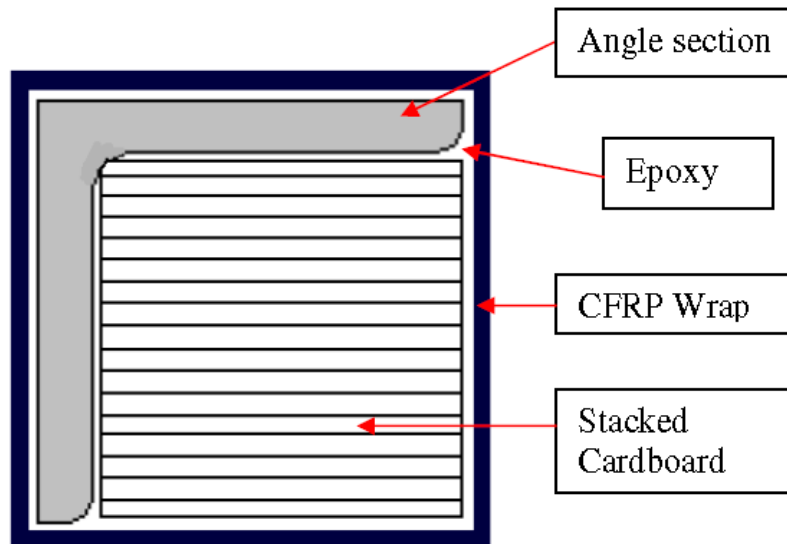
Schematic view of angle section with stacked cardboard and CFRP wrap
